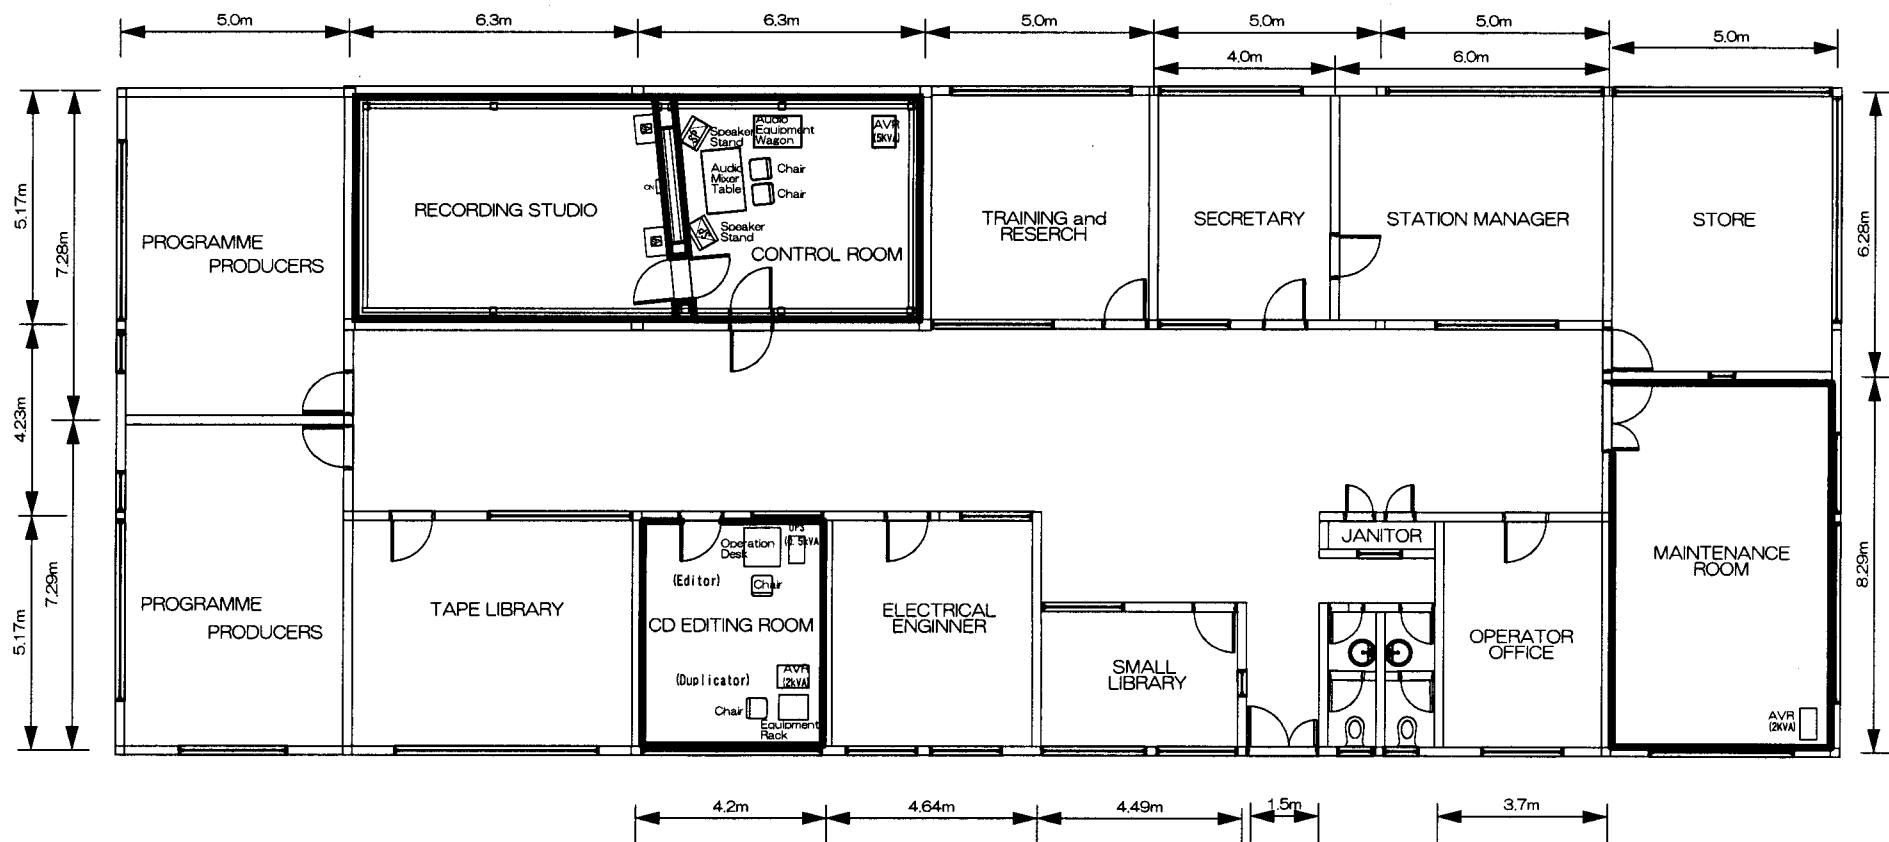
Floor Layout of Semera Radio Studio
